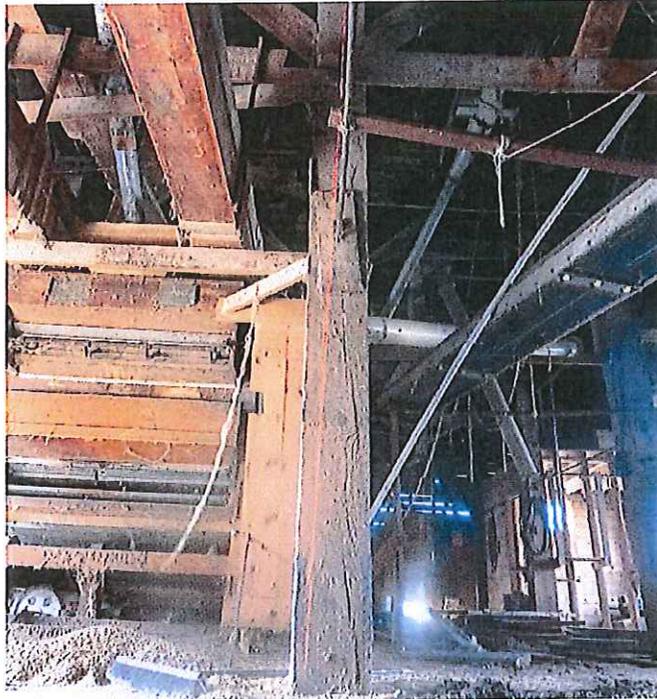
Interior column with laser-generated plumb-line showing westward deflection
